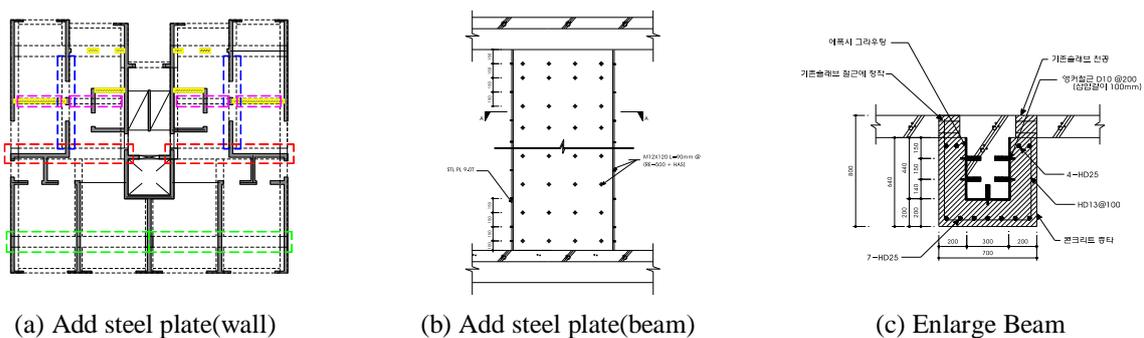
Retrofitting plan for reinforced concrete structure of multi-family house
